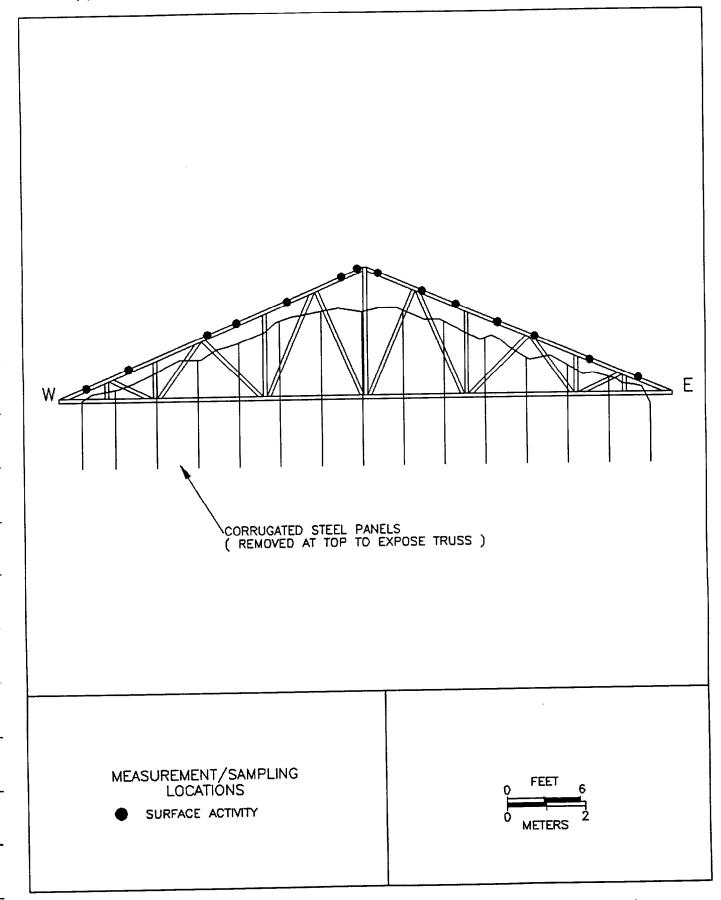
Building 3, North Wall — Measurement and Sampling Locations
